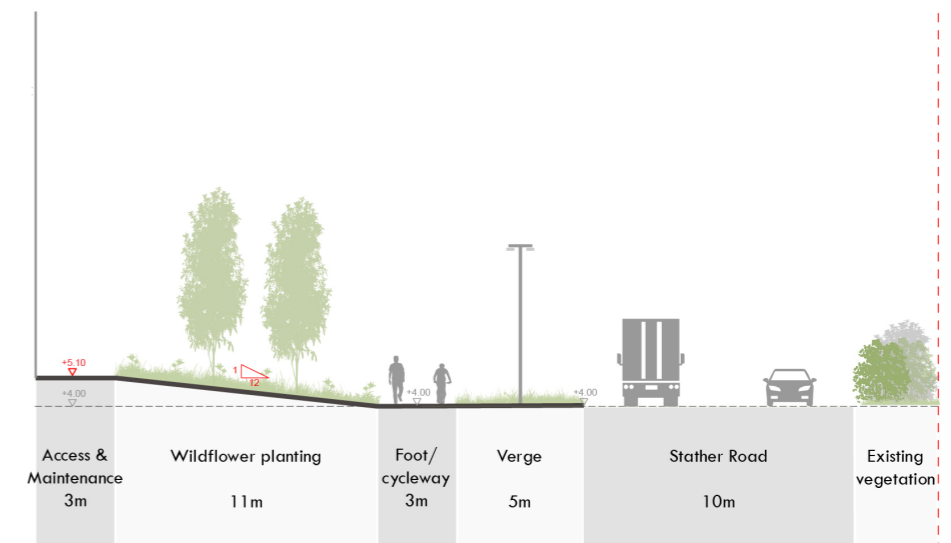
Illustrative section through Stather Road north of concrete block manufacturing facility
